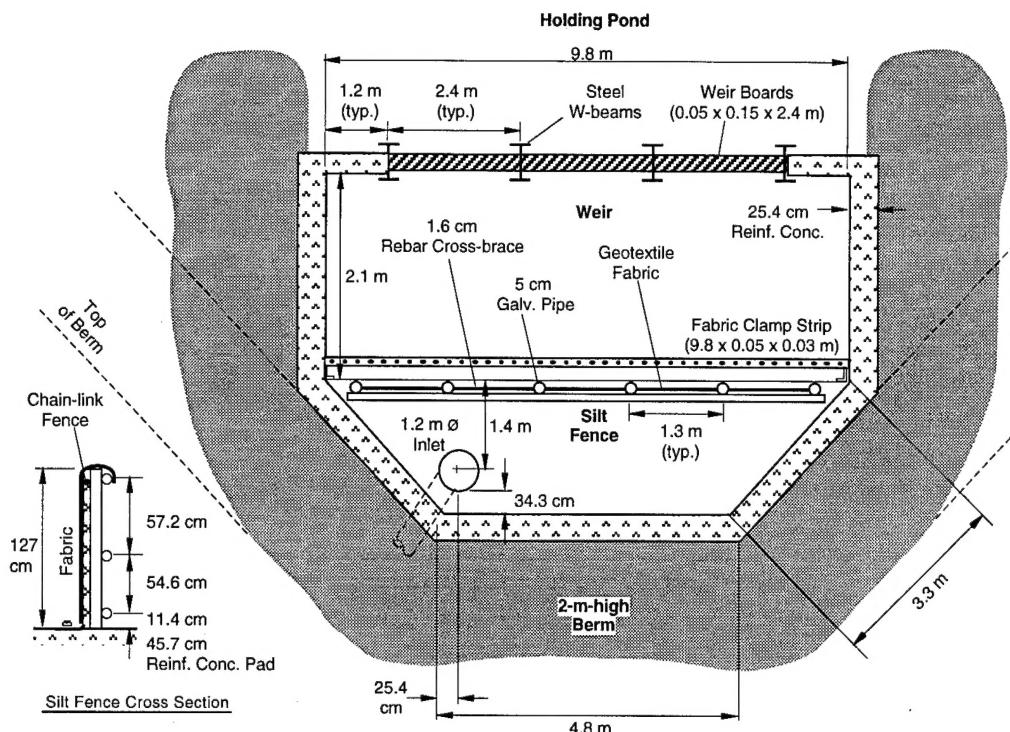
Plan view and cross section of the retention basin, with the inflow and outflow structures.
